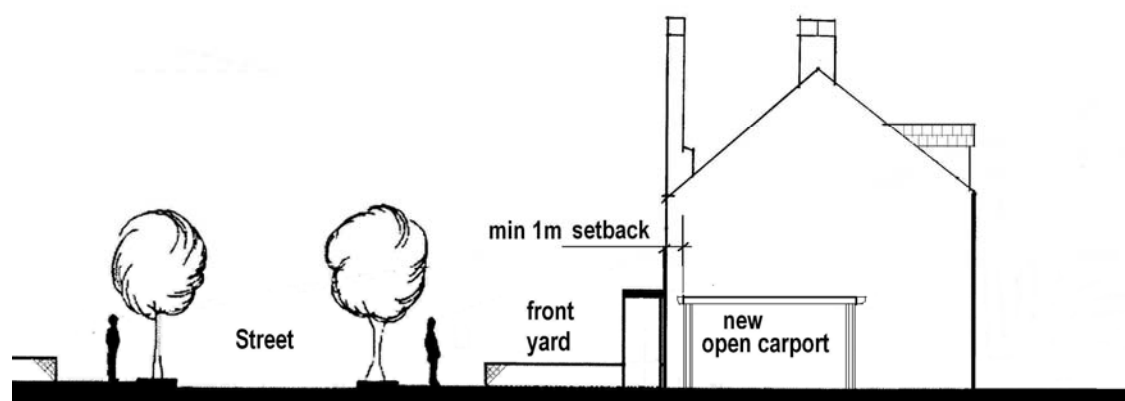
Side view – a new open carport must be set back at least 1 metre from the front façade of the dwelling.
